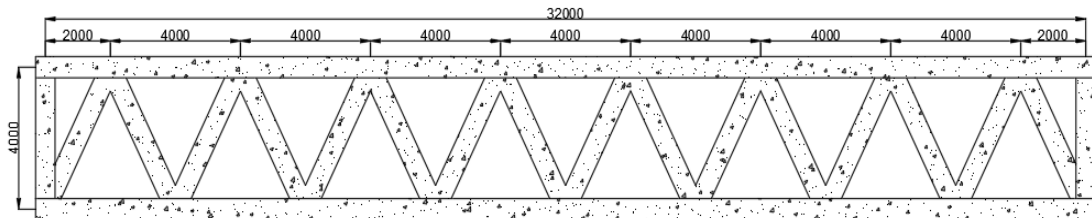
Rectangular plane trusses with few vertical bars (unit: mm)
